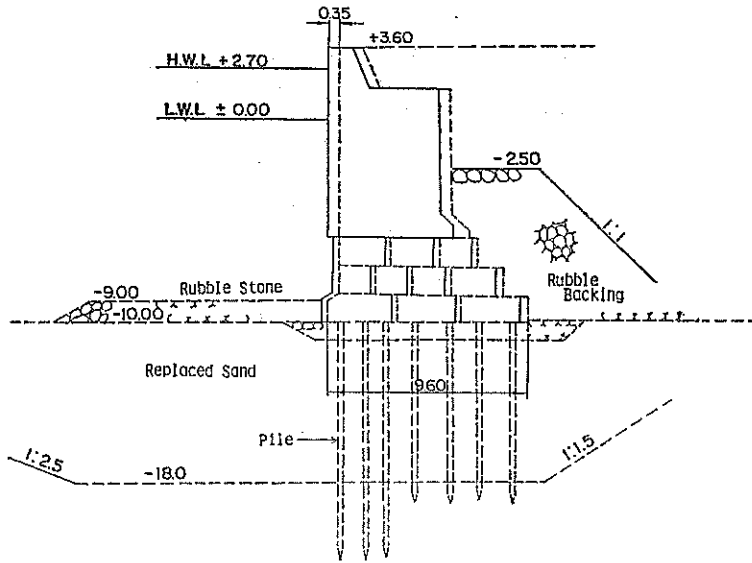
Damage of gravity quaywall (Pile foundation)
